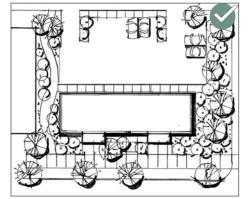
Locate a surface parking area to the interior of a site, away from the public realm.
